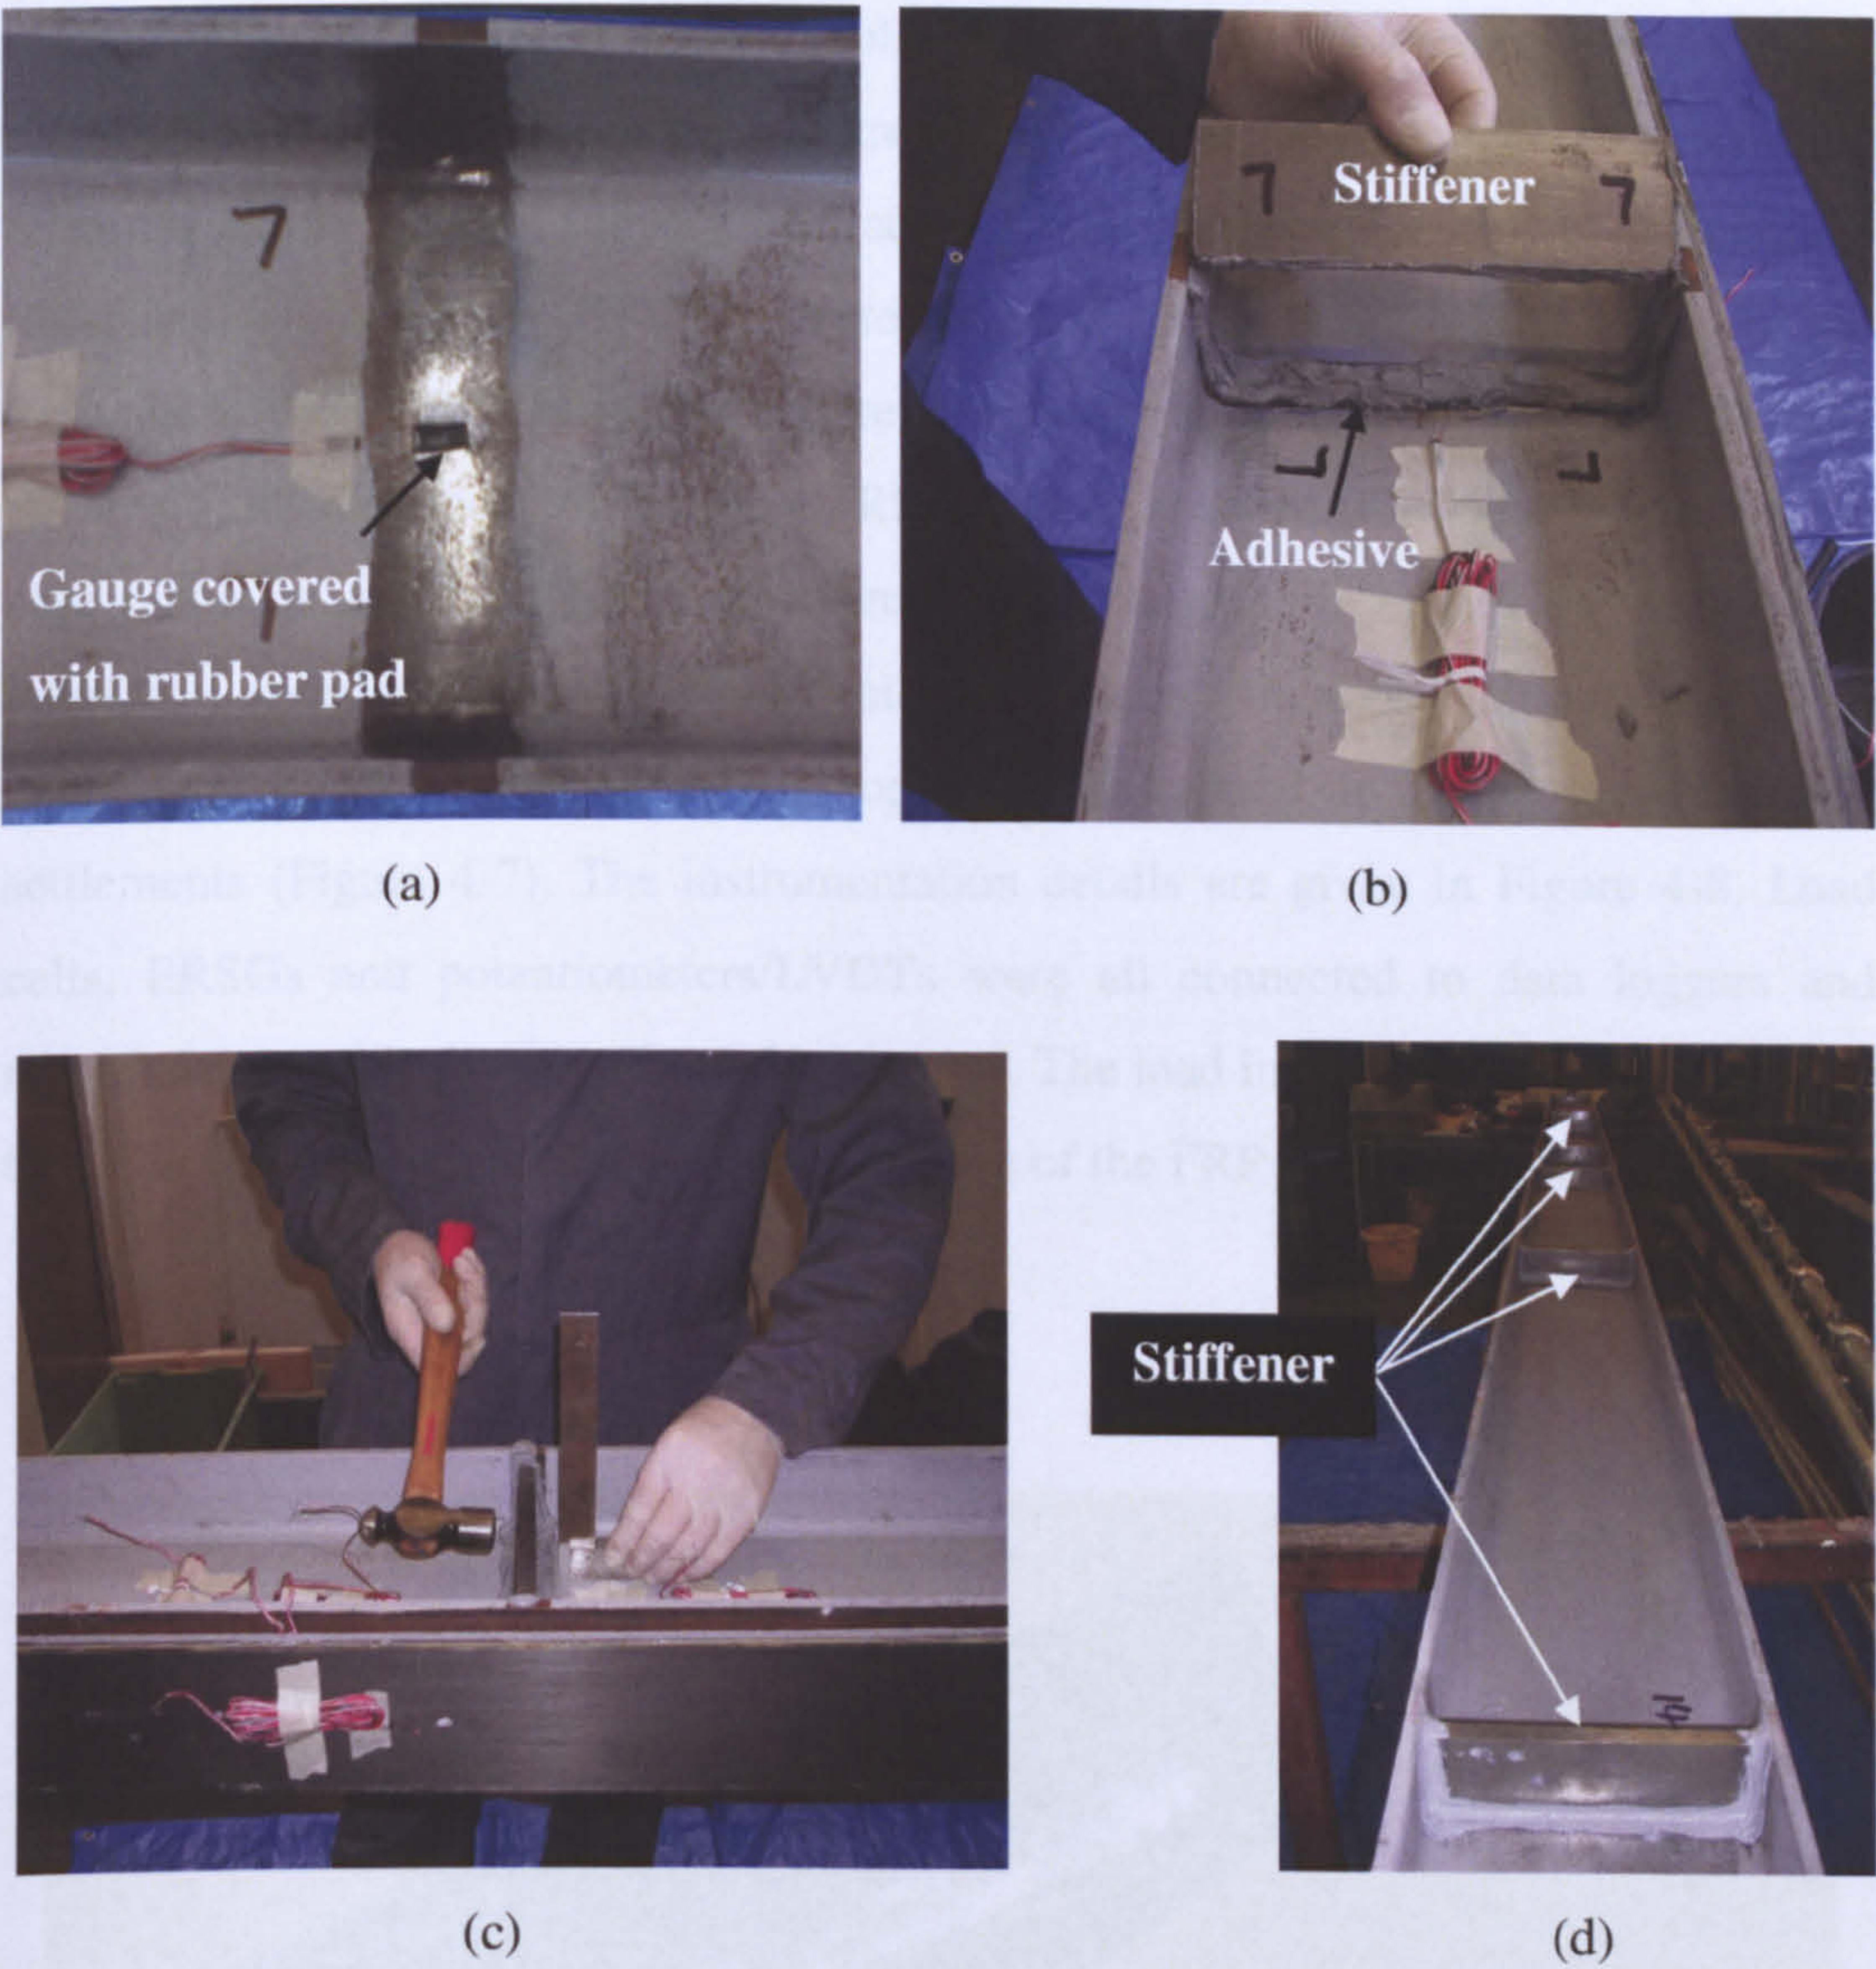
Bonding process for stiffening steel plates: (a) Surface cleaning and protection for strain gauges; (b) Fitting steel stiffening plates onto previously laid adhesive; (c) Adjusting the position of the plate; and (d) Final stiffener layout
